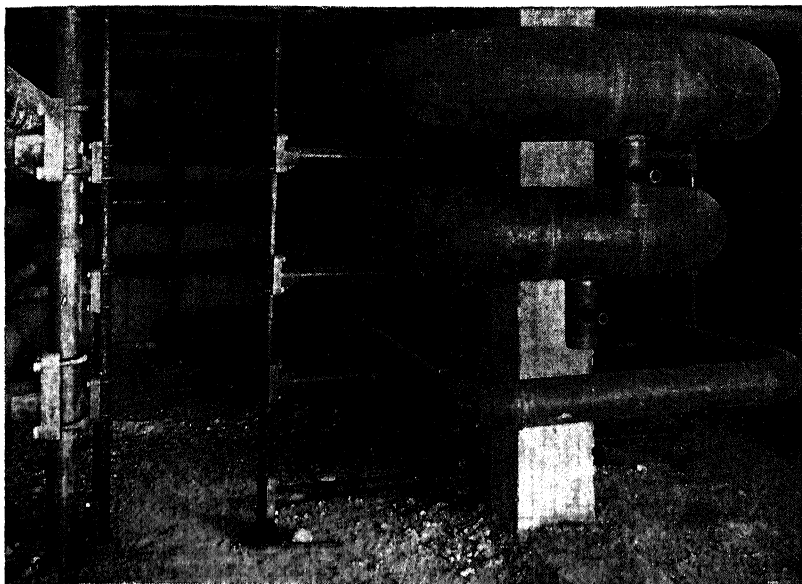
Portion of 47,000 feet of high pressure steam line installed by arc welding in a large hospital.
